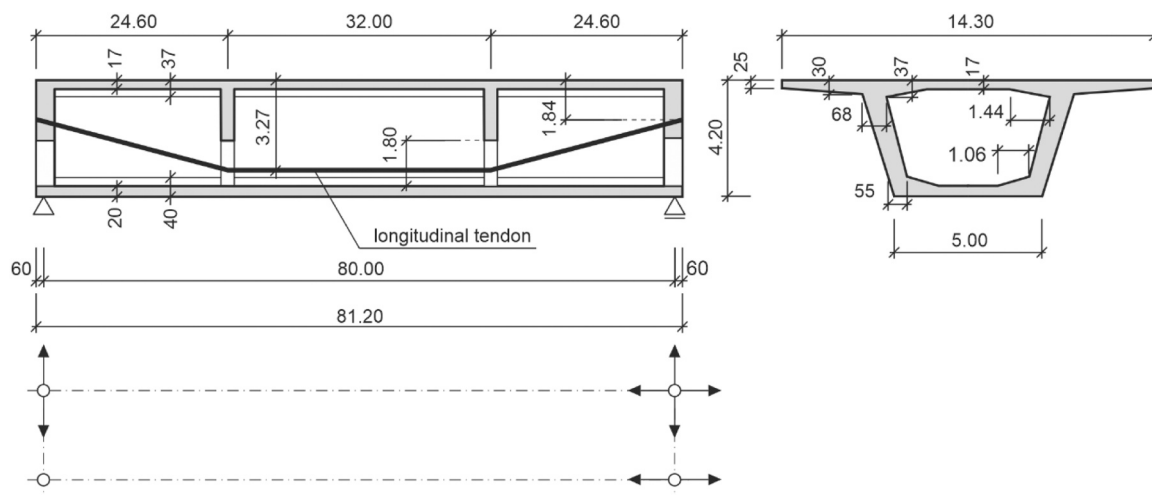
Externally prestressed reference road bridge M-NSC with box girder cross-section based on the example according to [30] (exaggerated representation): longitudinal section (top left), support arrangement (bottom left) and cross-section (right) (all lengths in [m] and all cross-section dimensions in [cm]).
